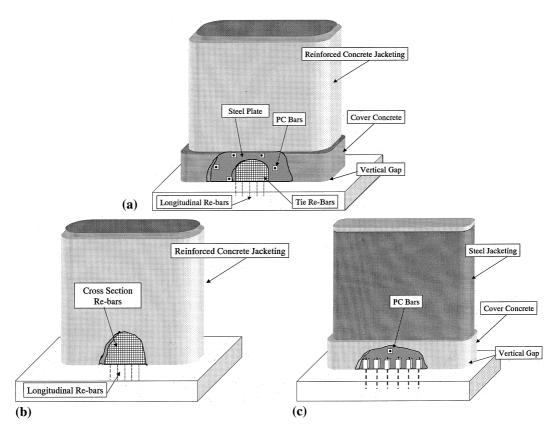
Seismic retrofit of wall-type piers by concrete jacketing method with tie-bars: (a) integrated seismic retrofit method with reinforced concrete and steel jacketing, (b) reinforced concrete jacketing and (c) steel jacketing.
